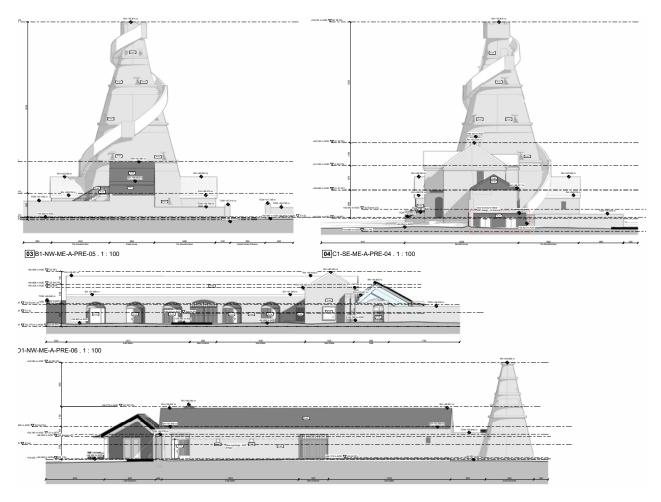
Proposed Elevation 03 +04 + 05 + 06 by Metropolitan Workshop
